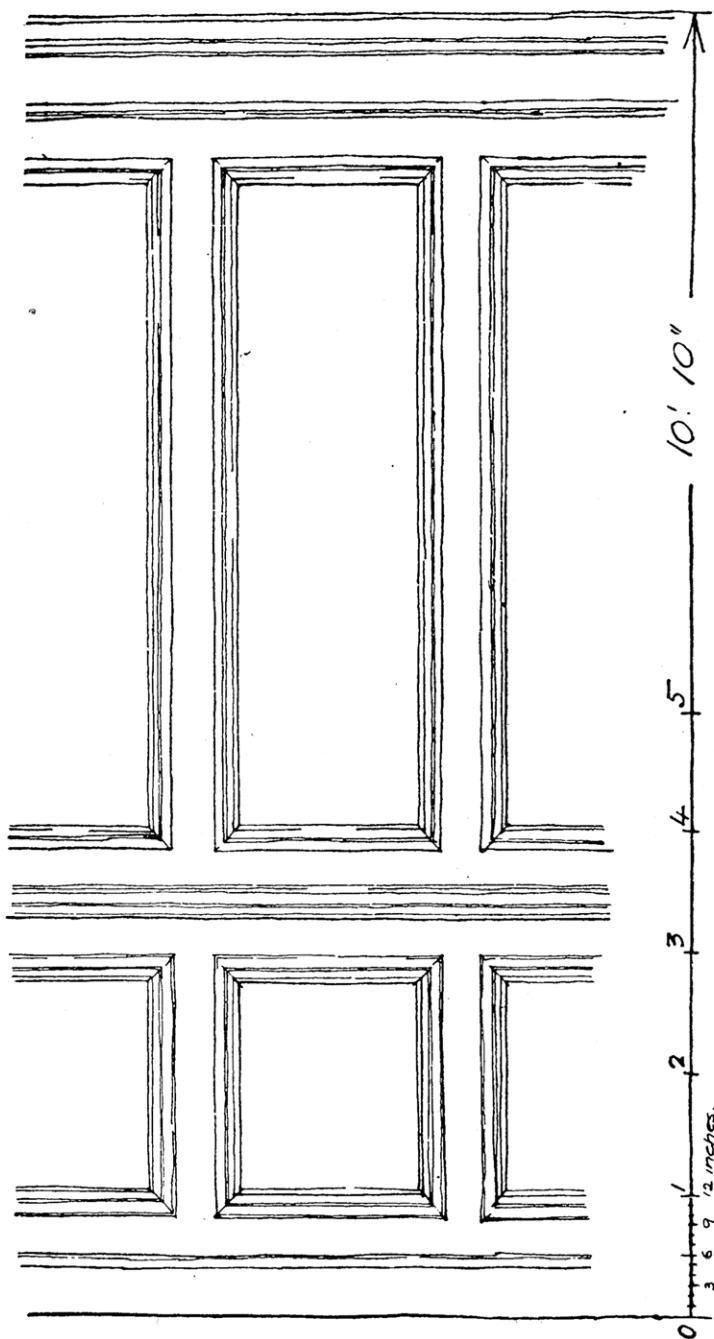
PLATE VI.—PANELLING IN PRIOR'S ROOM.
